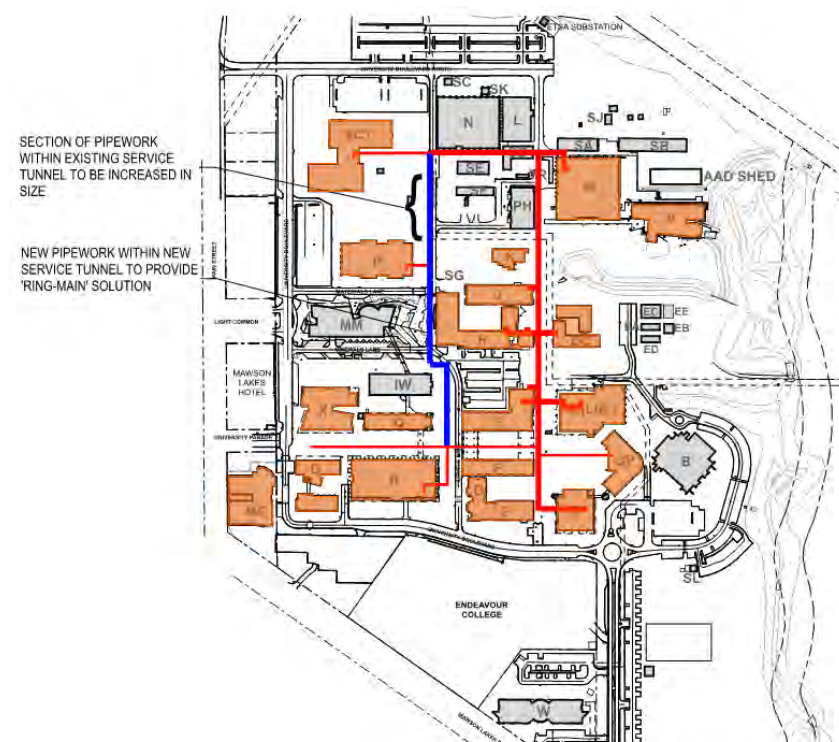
Proposed new service tunnel Stage 1 works to create 'ring-main' network
